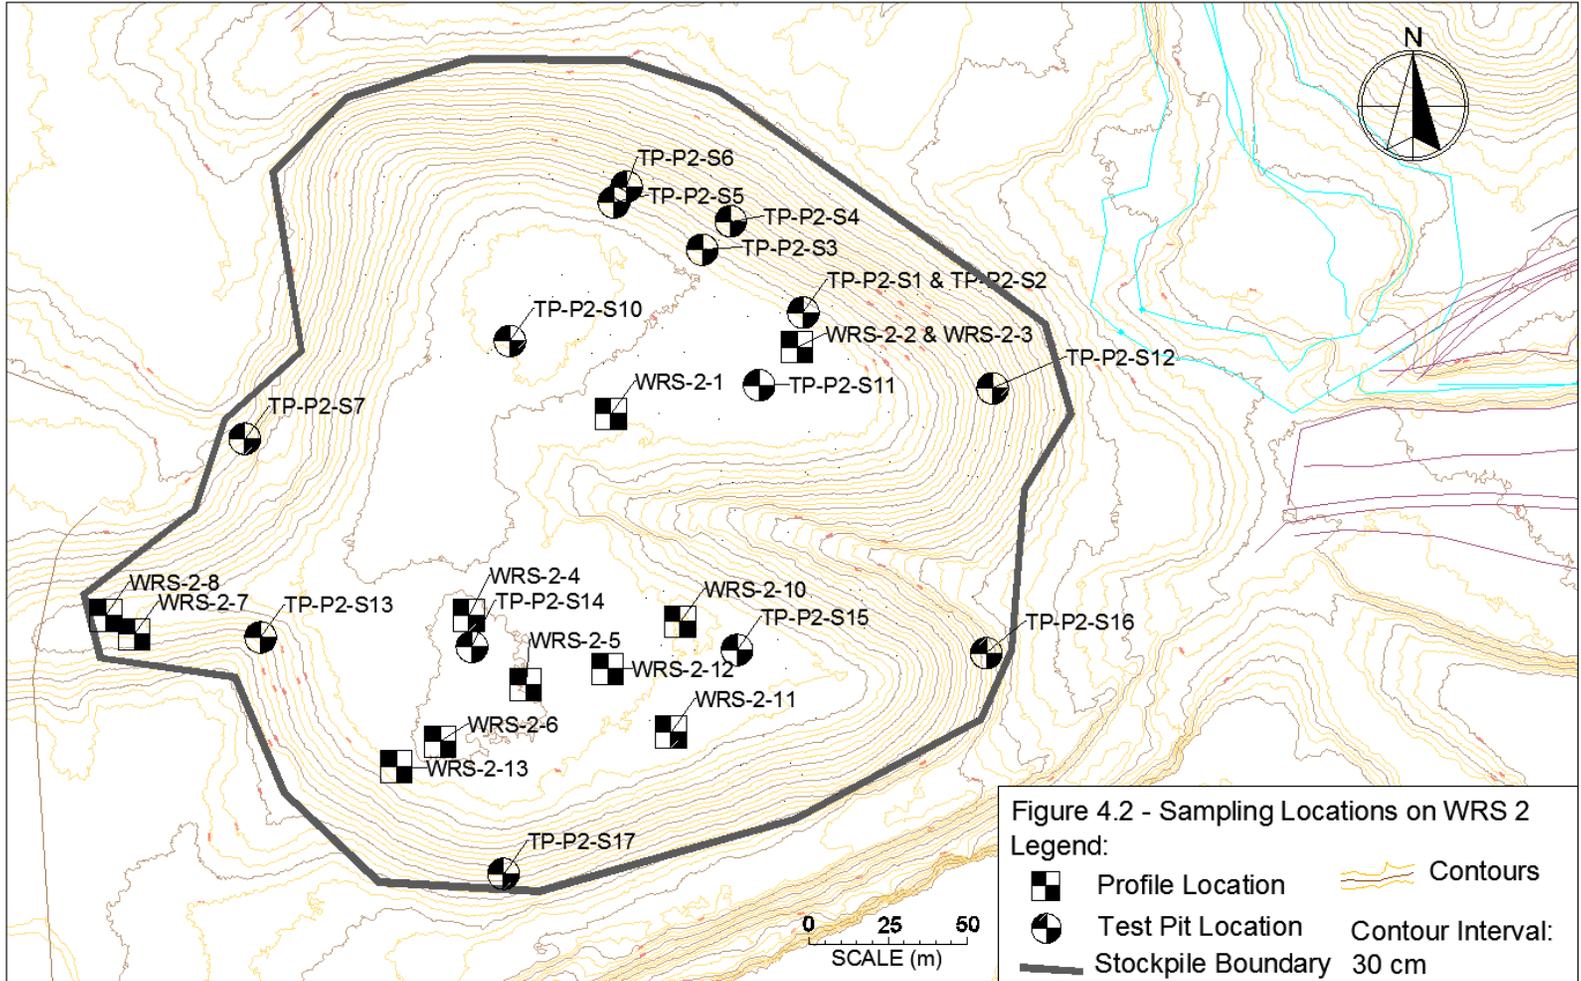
Test pit and profile sampling locations on WRS 2
